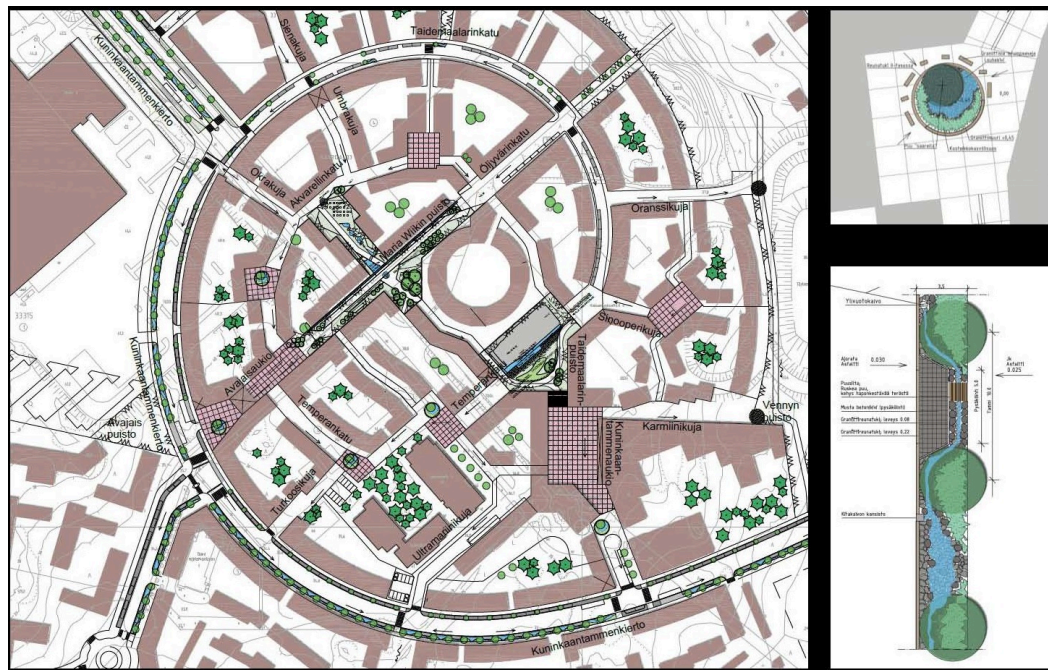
Plan of the central section of the KUNTA development, showing location of roadside swales, and their technical plans (right). Source: Suvi Tyynilä (2011), City of Helsinki.
